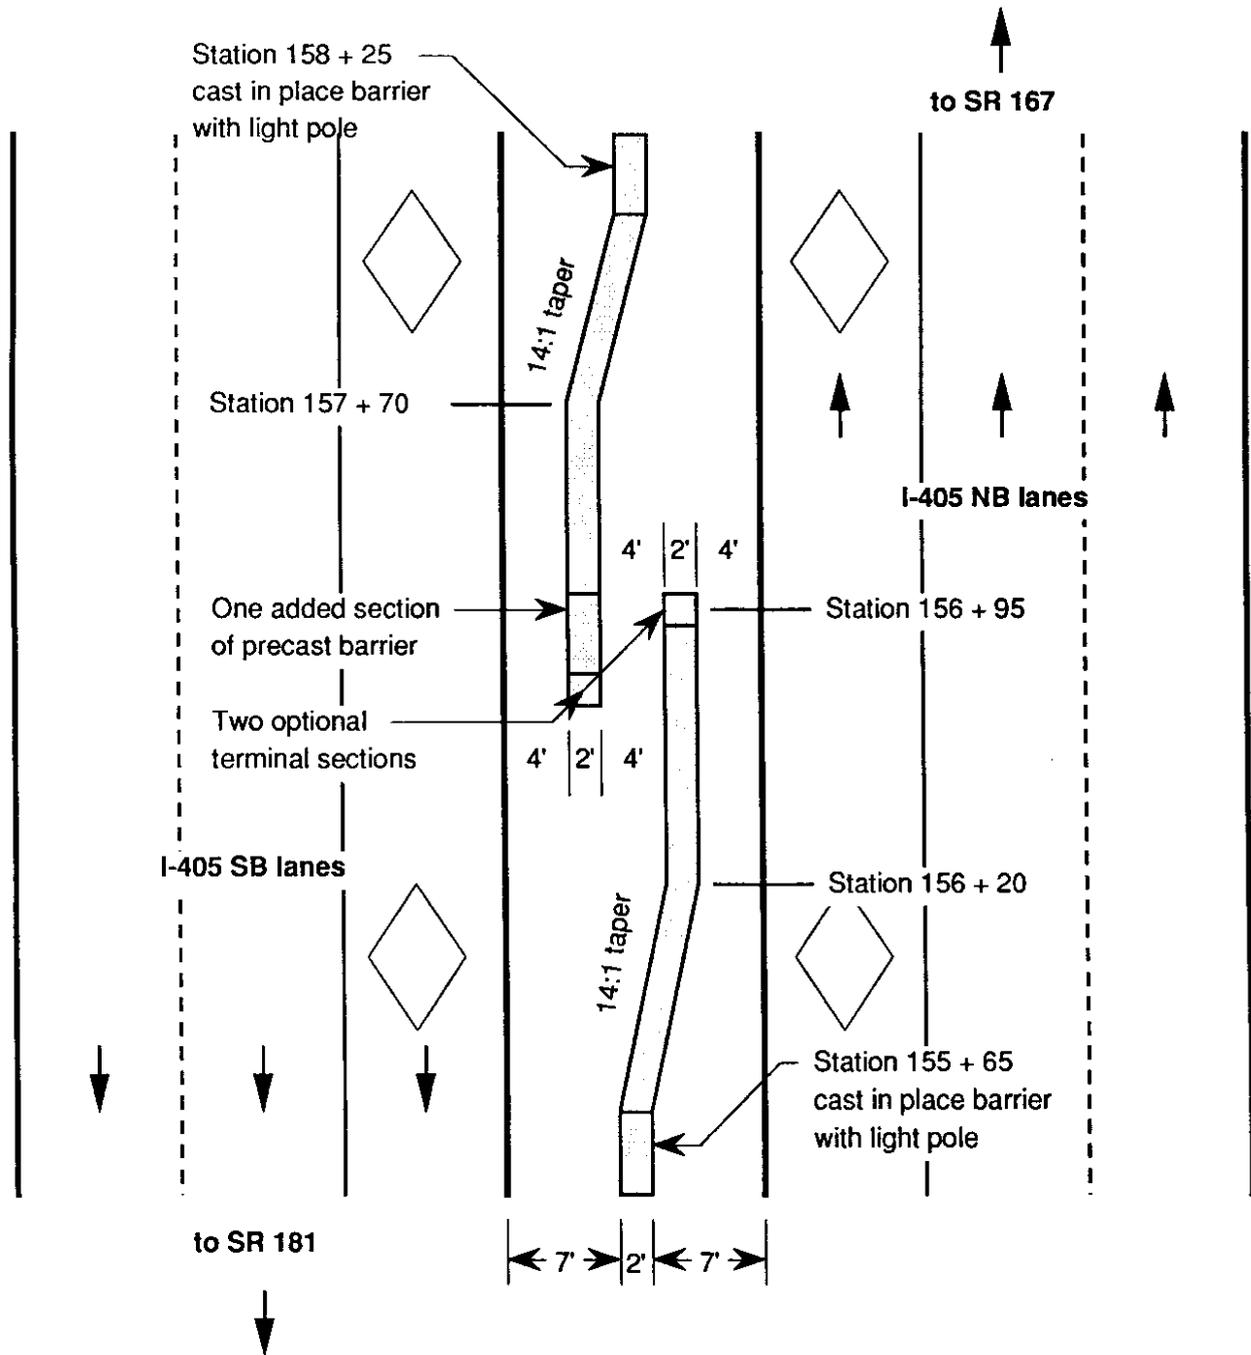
SR 405 Precast Barrier Relocation for Trooper Waiting Area (Plan View)
